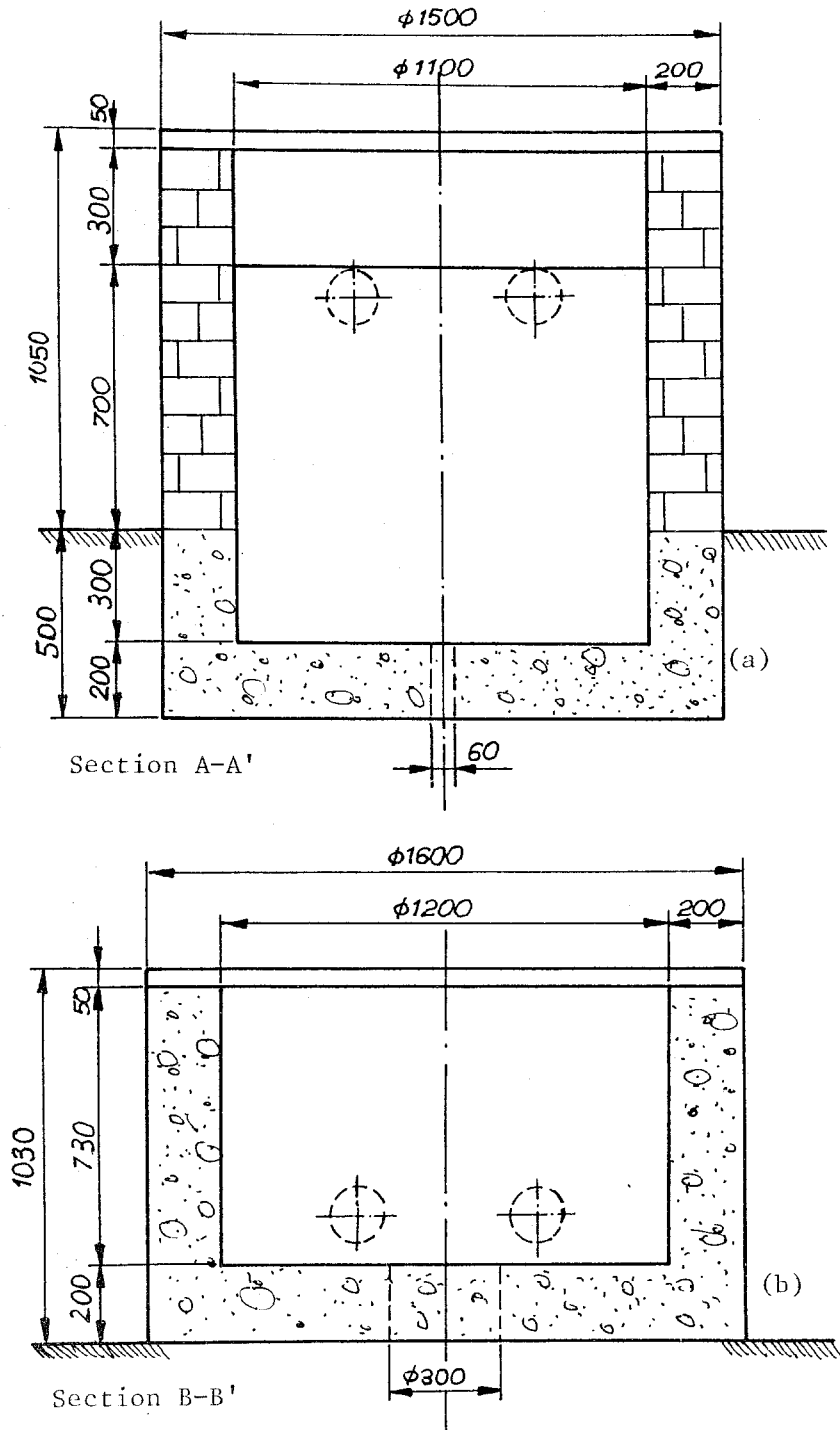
a) Cross-Sectional View of the Inlet Tank
